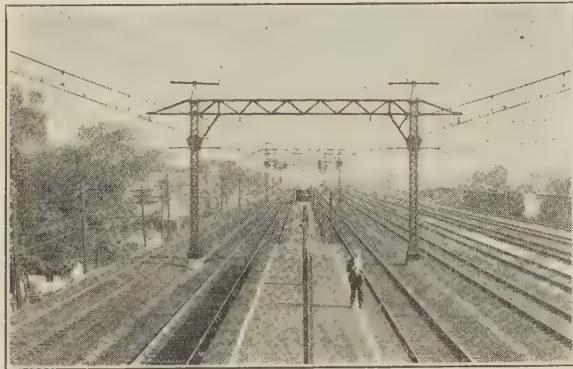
TYPICAL 4-TRACK CONSTRUCTION
